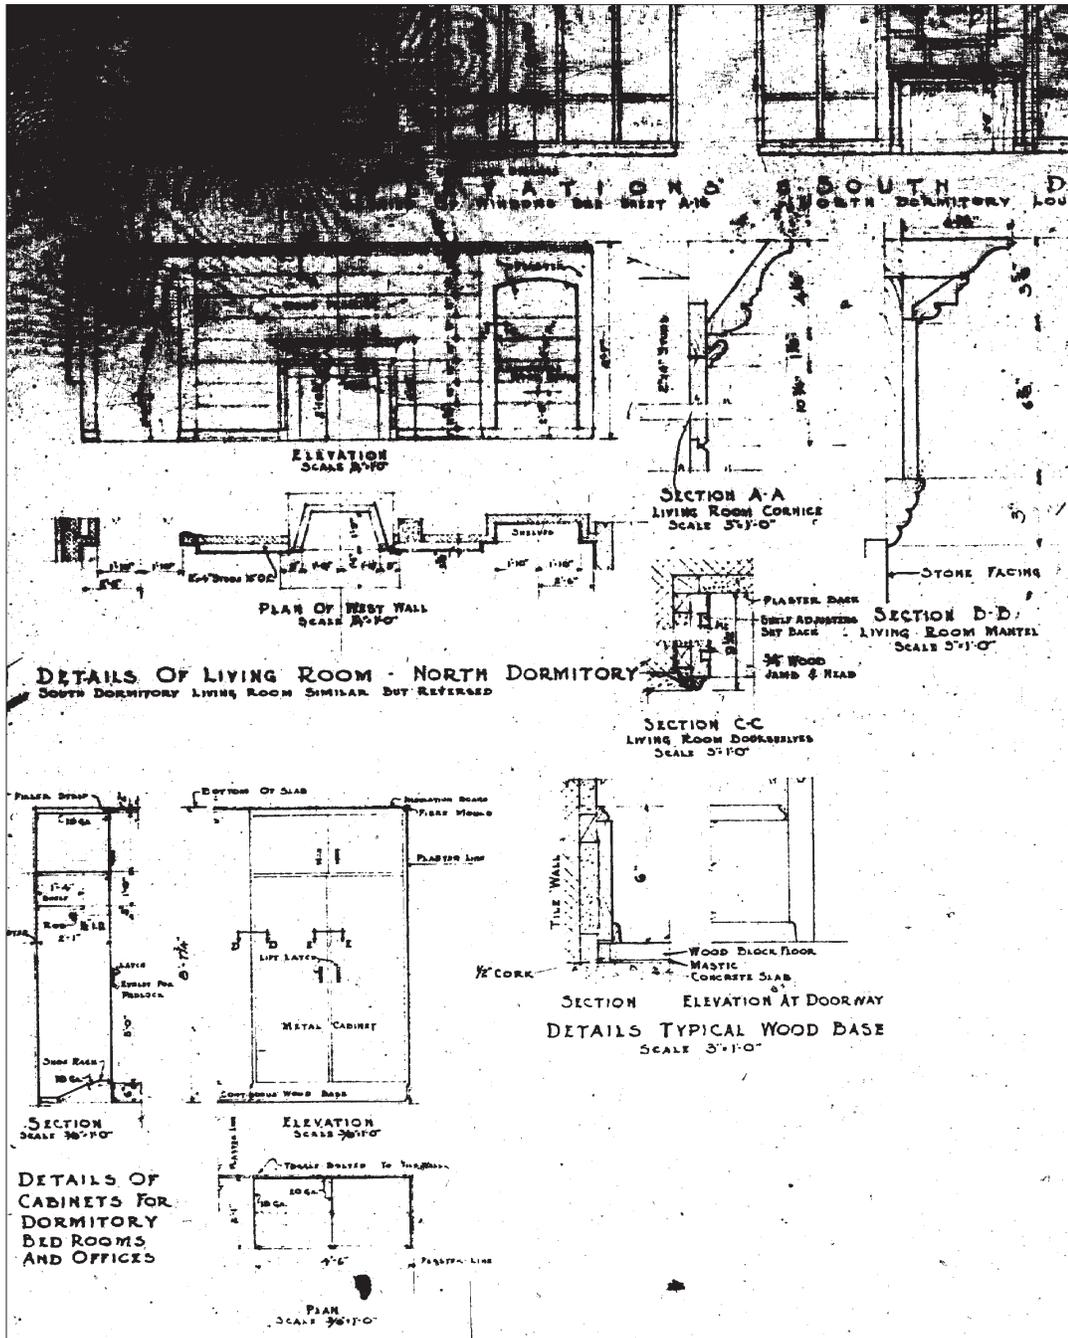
Detail of Room Details drawings for Harrison and Howell, sheet A20. Original Plans 1938.
